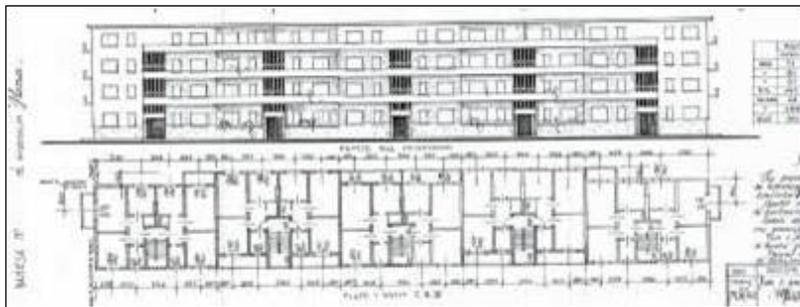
Fragment of the project for type 1 buildings, “Work” block
